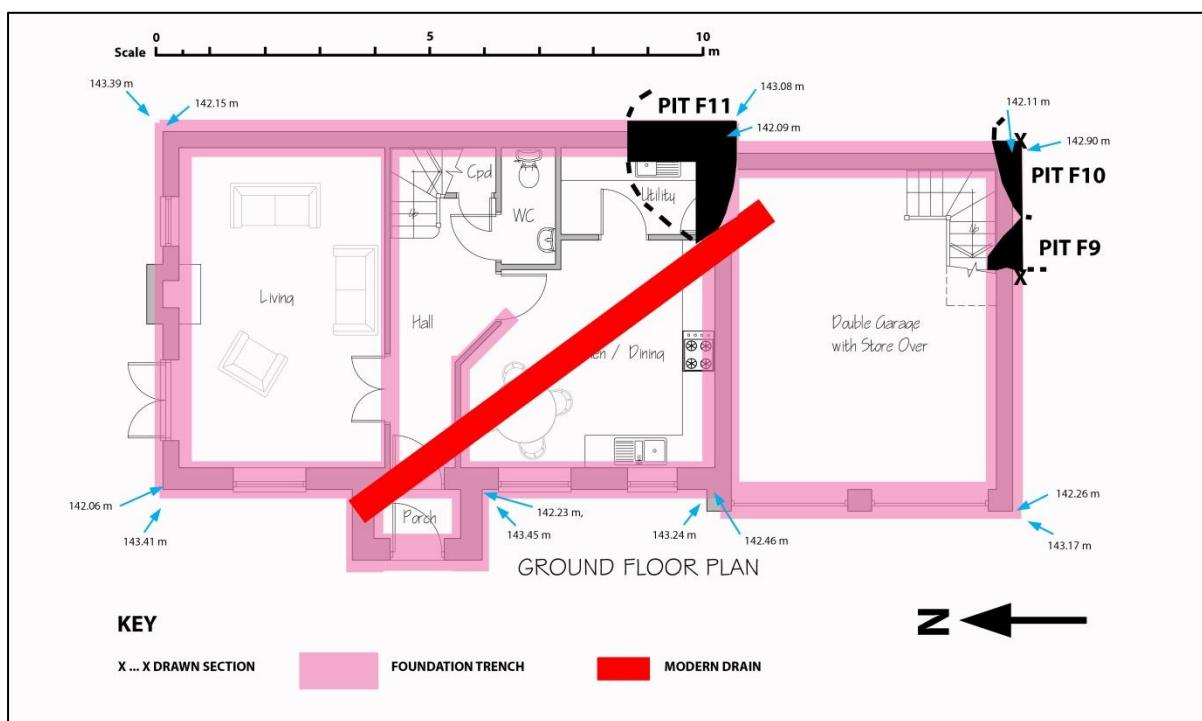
Ground floor plan showing positions of walls, foundation trenches, modern disturbance and archaeological features. The position of the section shown in Fig. 4 is indicated by X-X. The plan above is based on an electronic copy of the Architect's plan submitted with the planning application, at a scale of 1:50. The black areas showing the pits show their plan as exposed below the reinforced concrete in the case of Pits 9 and 10, and below turf in the case of Pit 11; the dashed lines show the likely projections of the pit edges. The positions of spot heights are shown by blue arrows, the digits are metres above OSD Newlyn; the TBM is taken from Hughes 2009, Fig. 2.
